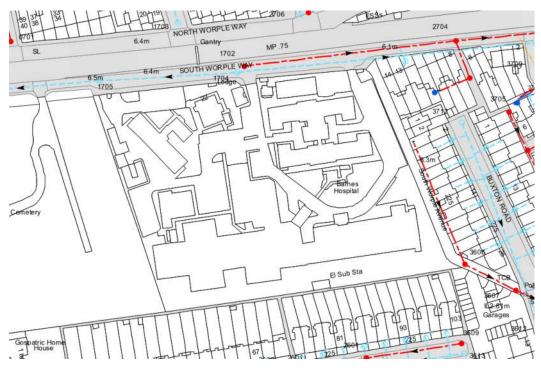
Existing drainage around Barnes hospital site (from Thames Water (TWUL) Asset Location Search (ALS))
